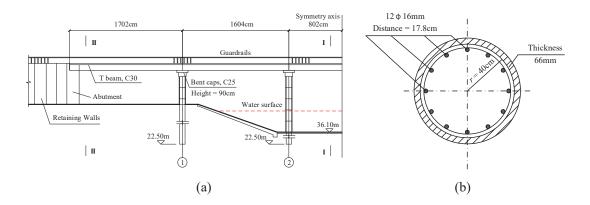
The Shuangying Bridge. (a) side view; (b) pier section.
